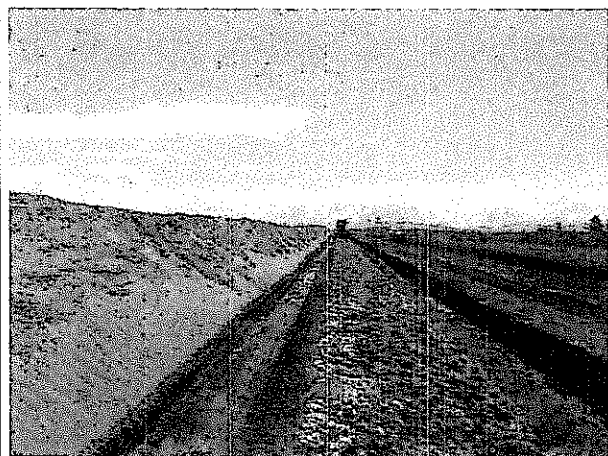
Looking southeast along South embankment, grading back Zone U material prior to placement of fill core.
